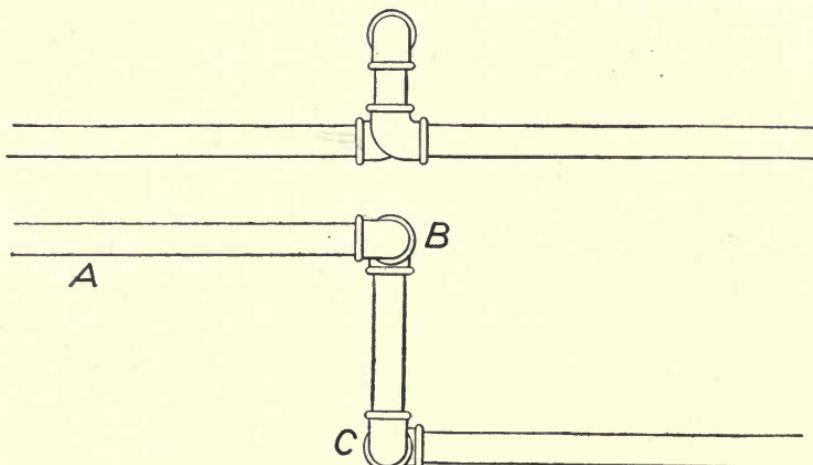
Elevation and Plan of Swivel-Joint to Counteract Effects of Expansion and Contraction in Pipes.
